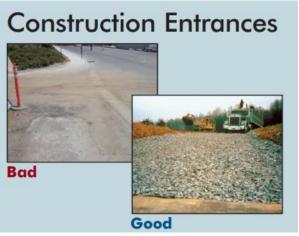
Stabilized gravel construction entrance examples (EPA 2003).
